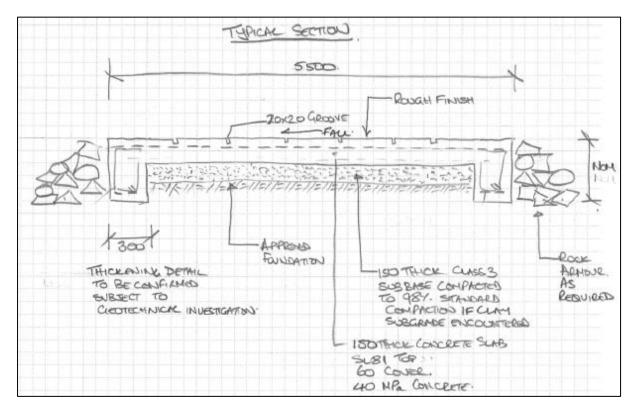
Section detail of slipway (Source: Pitt and Sherry).
